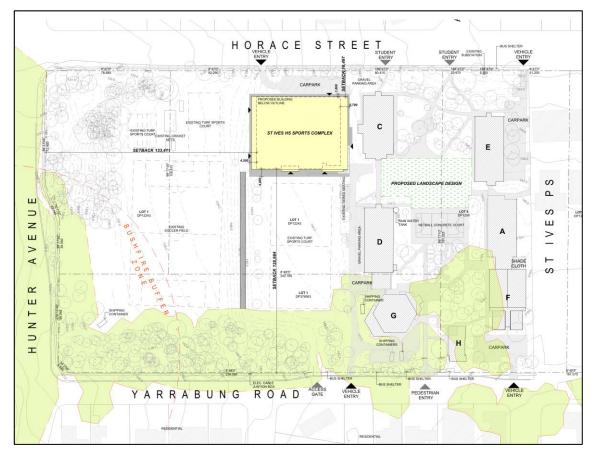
Proposed site plan - Drawing number: DA-03 Rev E, dated: 14/11/18 (JDH Architects)
